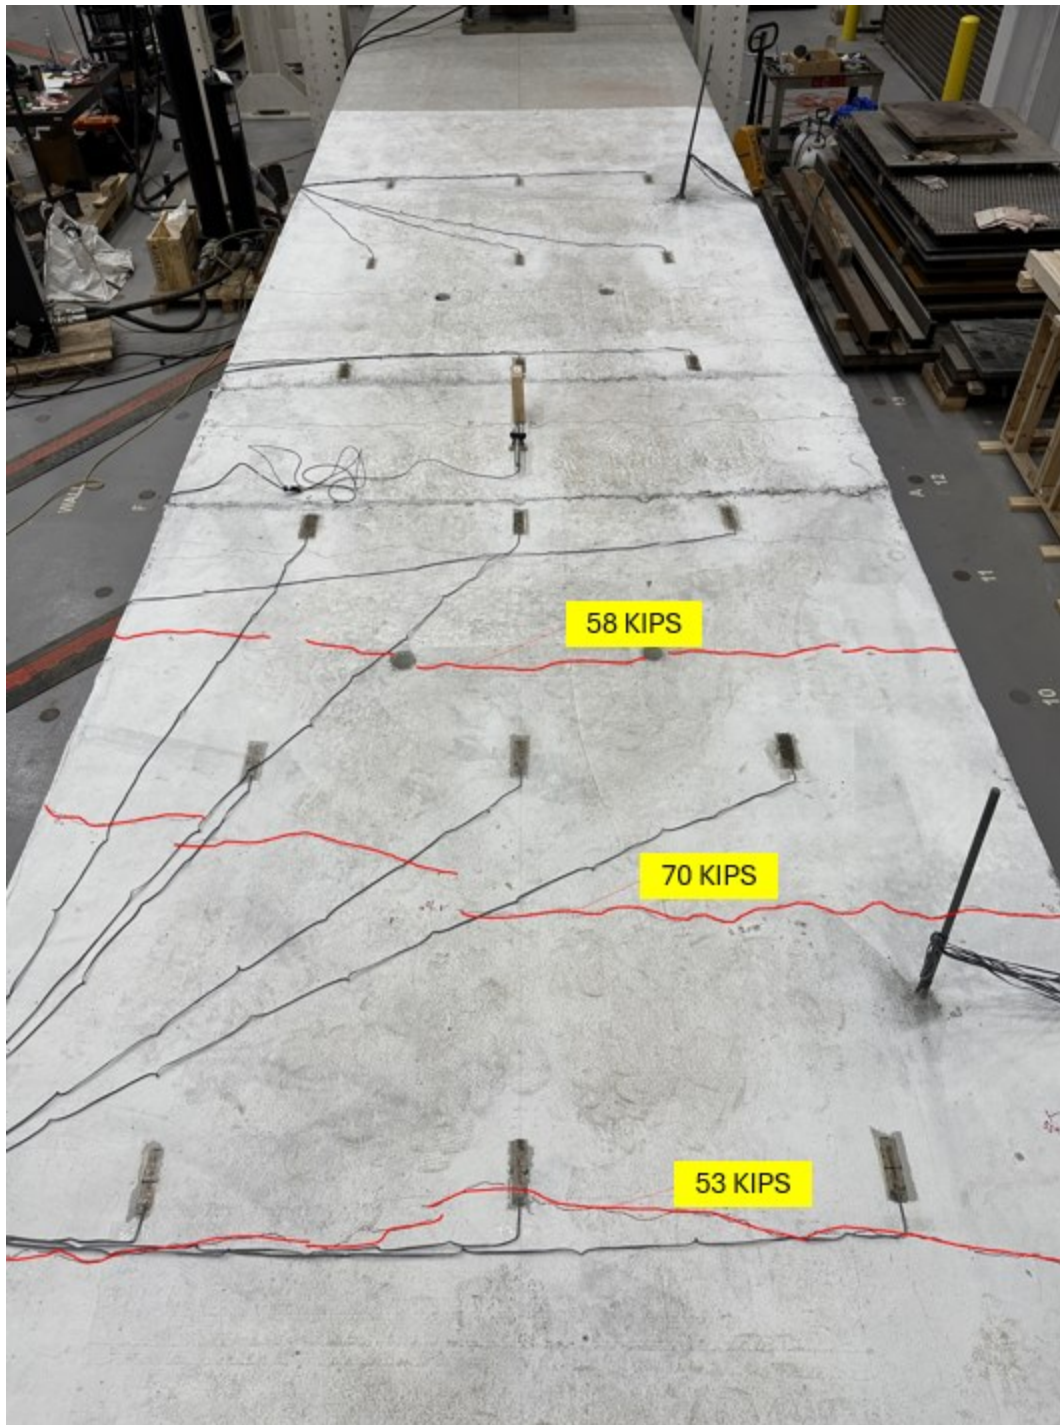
Cracks on West Side of Concept A after Ultimate Testing.
